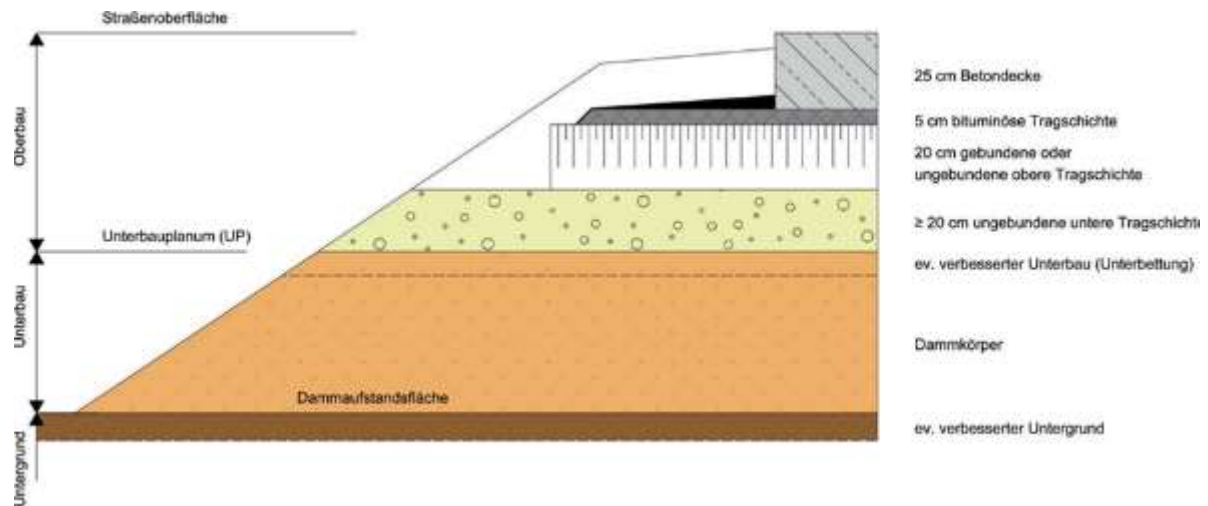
Street body with concrete pavement (schematic) (Blab, Hoffmann et al., o.J., S. 36)
